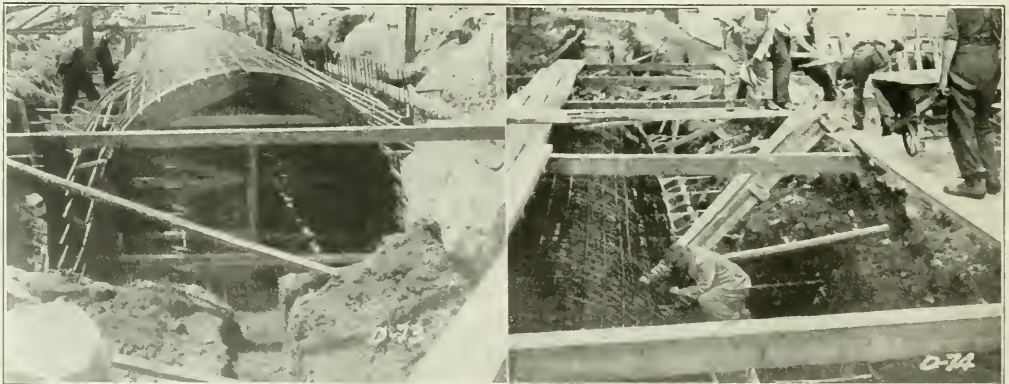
CONSTRUCTION VIEWS OF 10-FT. COVERED SECTION OF FALL RIVER (MASS.) INTERCEPTING DRAIN. Left: Forms Ready for Pouring Invert and Walls. Outside Arch Forms and Reinforcement Placed After Invert and Wall Have Set. Right: Pouring Invert Through Opening Made by Omitting Boards in Arch Form.
